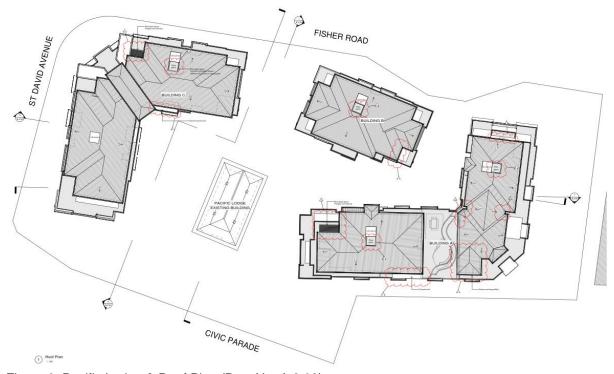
Pacific Lodge & Roof Plan (Dwg No. A 2.08)
